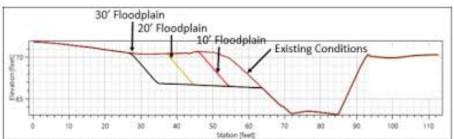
Typical cross section showing the three different floodplain bench alternatives.
